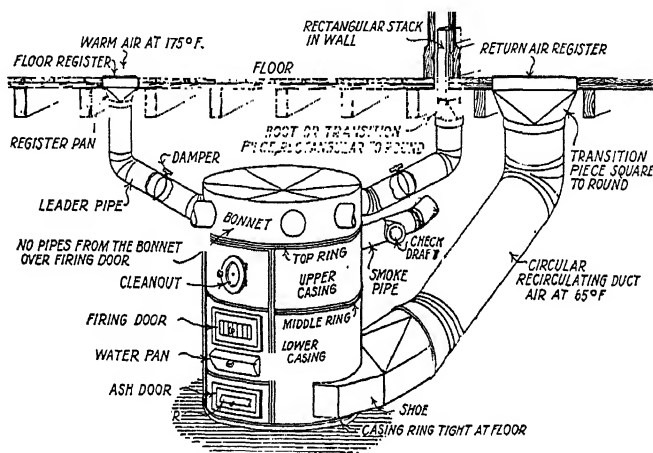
General Arrangement of Details of a Warm-Air Furnace with Connecting Pipes
